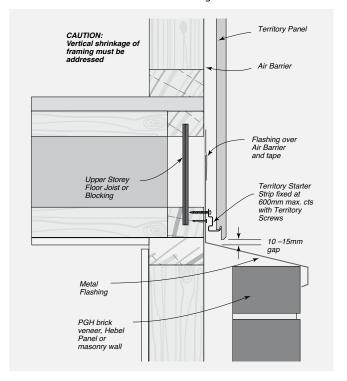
Second Storey Junction with Masonry, Brick Veneer or Hebel Panels – In-line Framing
